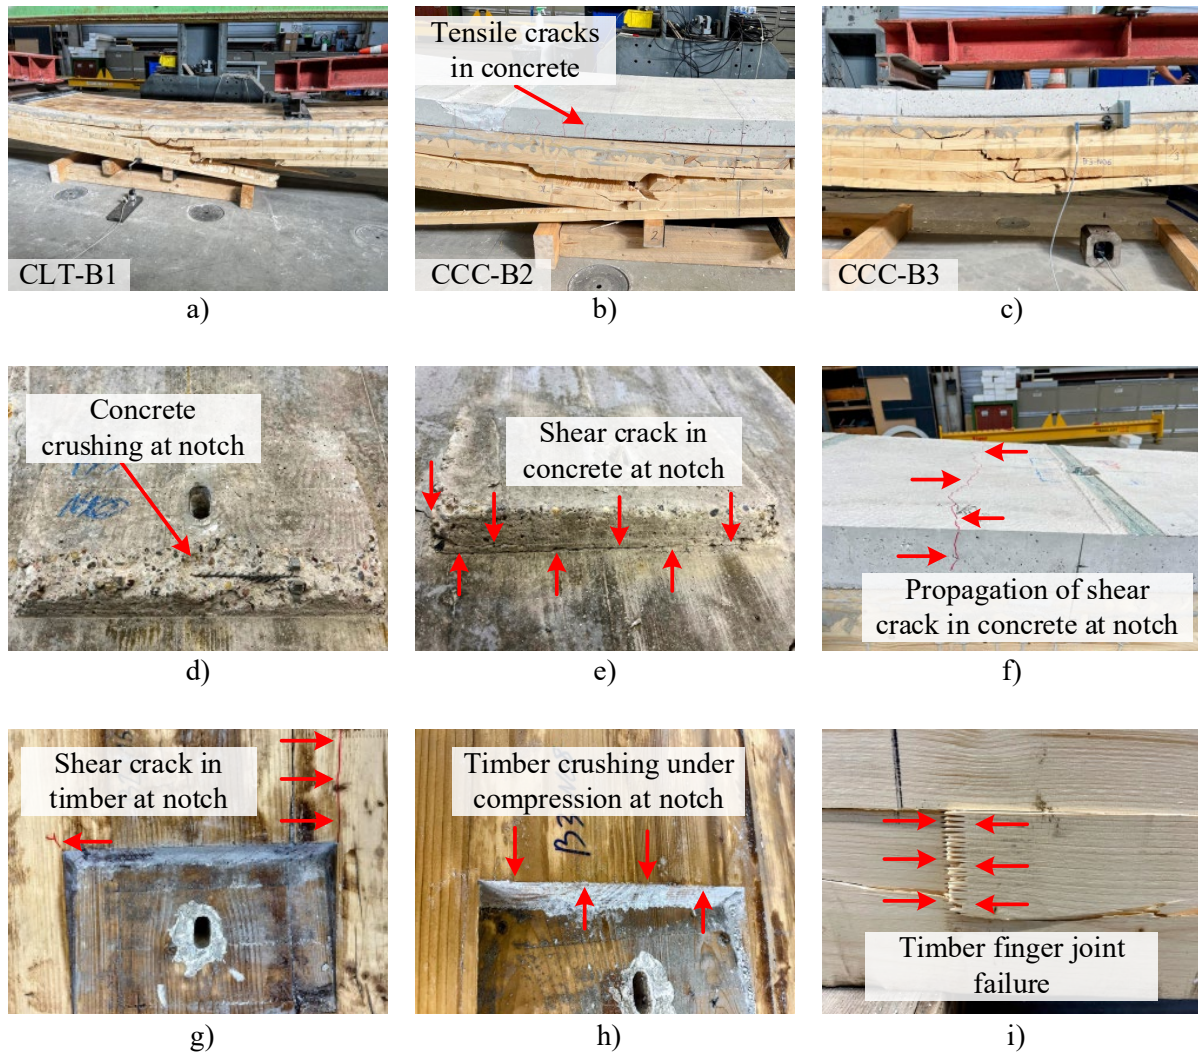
Failure modes of the specimens: a) flexural failure of the CLT panel in CLT-B1, b) flexural failure of the CLT panel and tensile crack opening in concrete in CCC B2, c) flexural failure of the CLT panel in CCC-B3, d) concrete crushing under compression at the notch, e) shear crack opening in concrete at notch, f) shear crack propagation at the concrete from notch to concrete surface, g) shear cracks in timber at notch, h) timber crushing under compression at notch, i) finger joint failure in the tensile zone under bending at the midspan.
